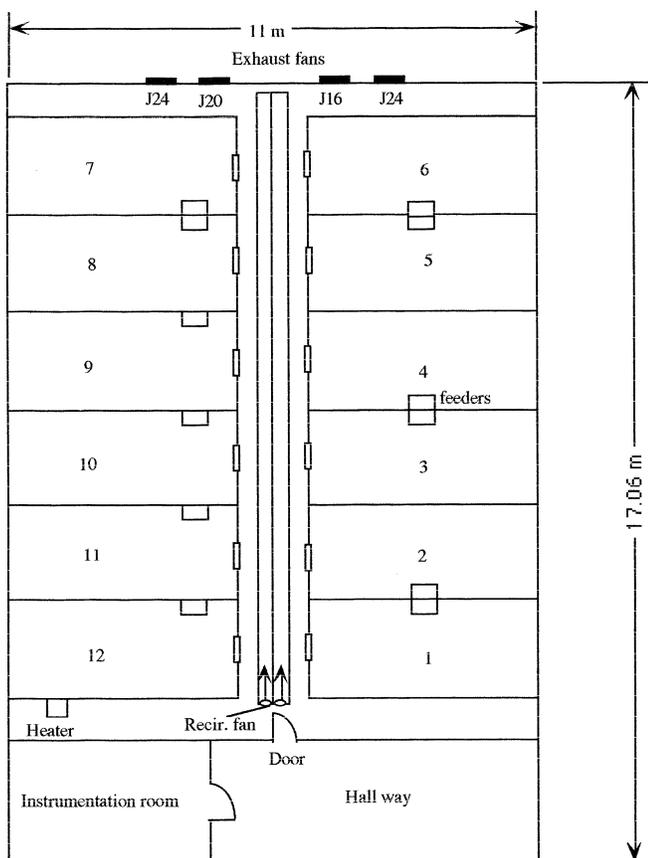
The floor plan of the grower-finisher room and adjacent areas
